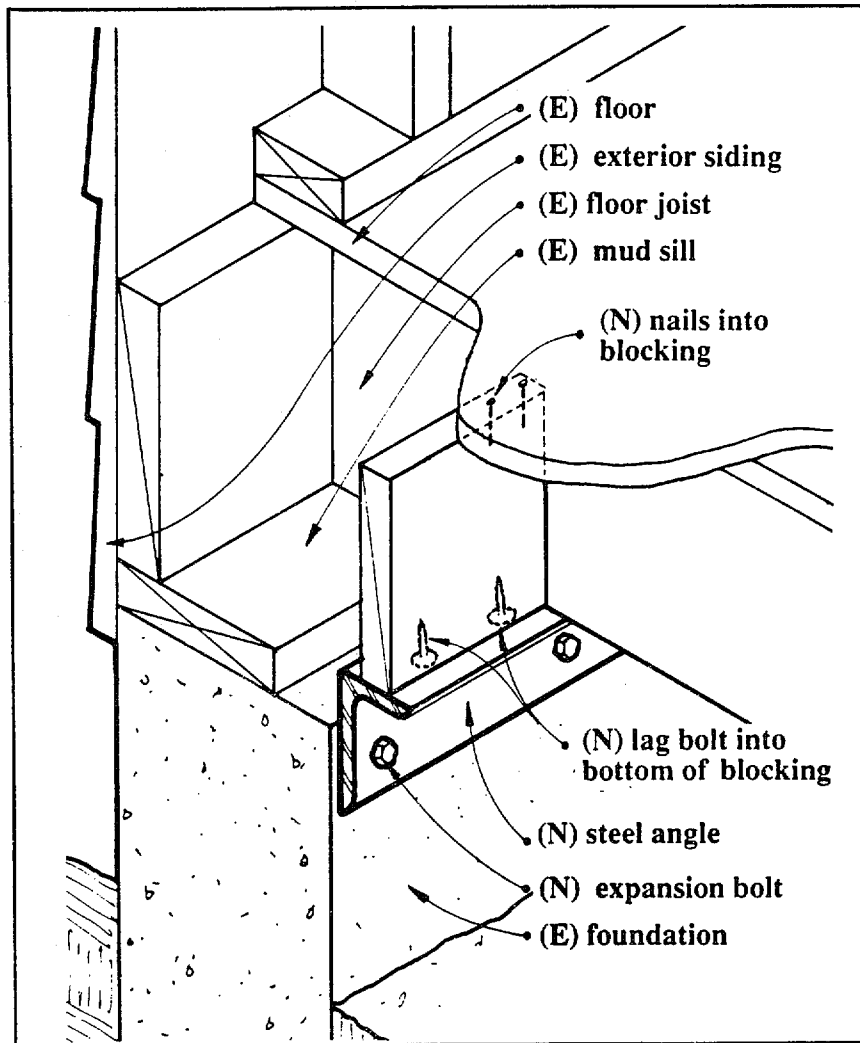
Alternate detail for providing wall to foundation anchors.
